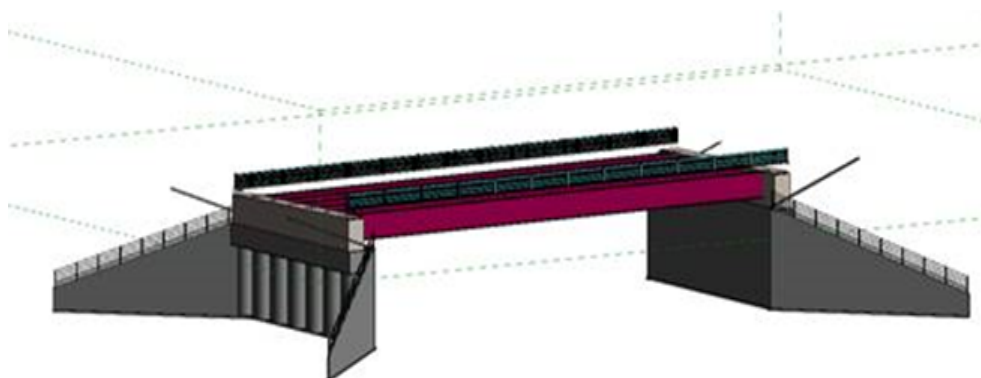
Schematic of Proposed M5 J10 South Bridge
